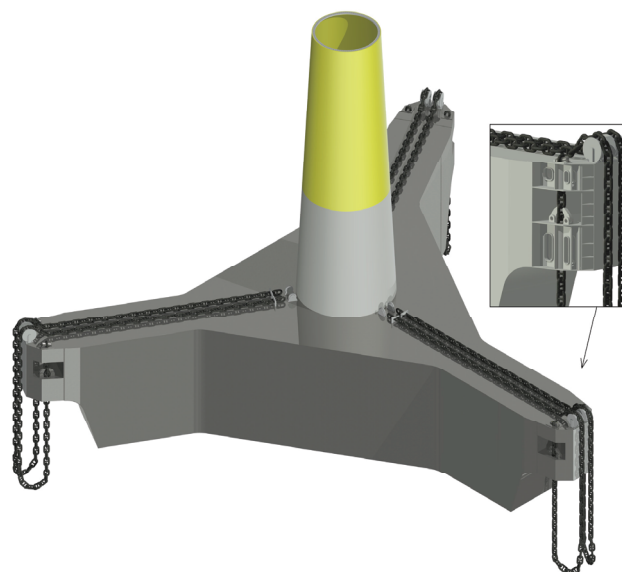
Simplified isometric drawing of the platform prepared for towing. The enlarged section shows the method of fastening of upper anchor chain ends to the platform arm.
